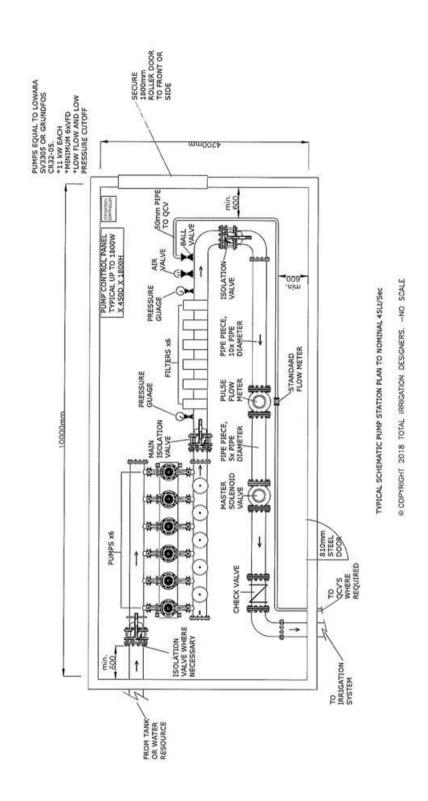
Pump Station Schematic Layout – Flows between 36 to 45 Lt/sec
